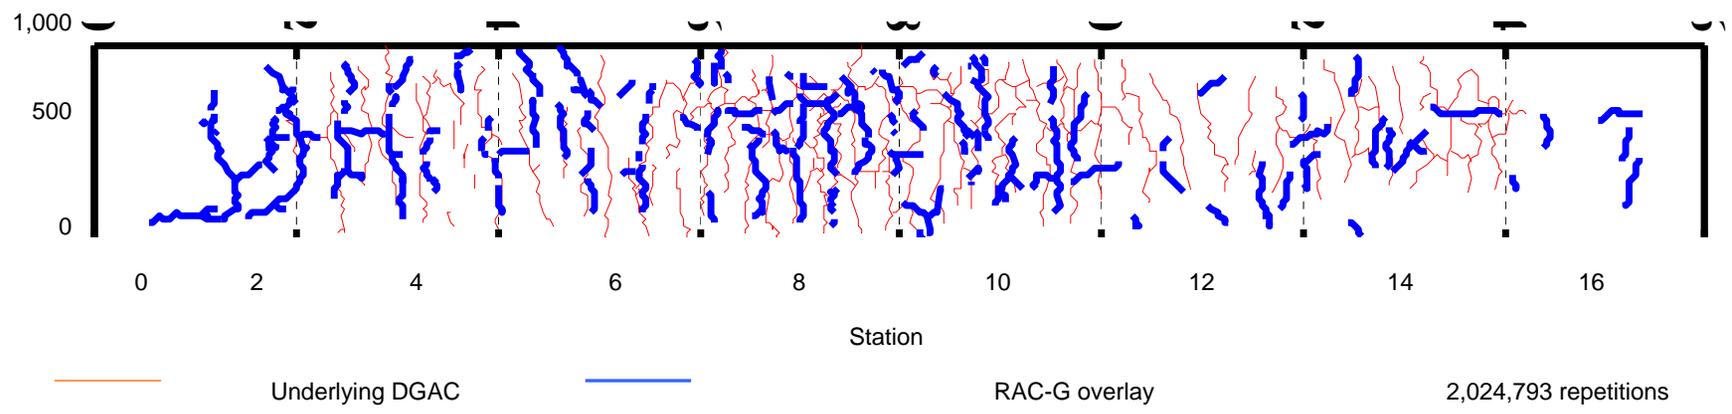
Surface cracking after Phase II trafficking showing cracking in both underlying asphalt and overlay.
